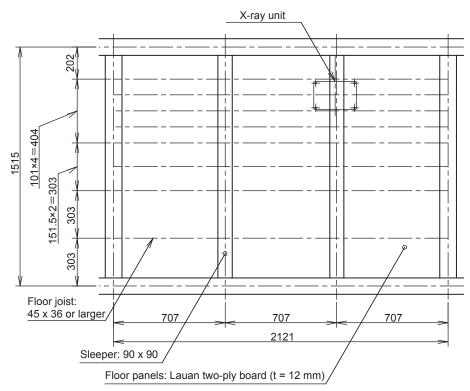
Example of conventional wooden construction with floor joist reinforcing (wall-mounted)
